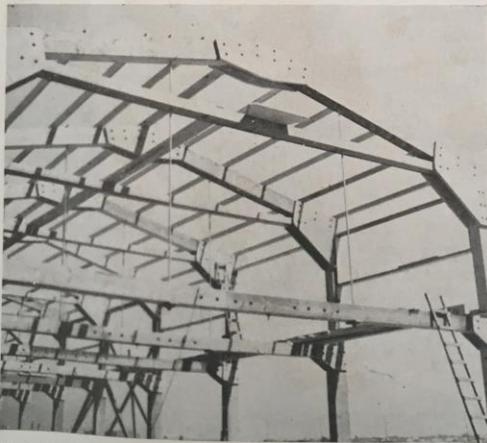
Rigid frames for this 40x160-ft. building aid in supporting the second floor by means of 1½-in. dia. rod hangers. Gusset plates are of plywood and split ring connectors are used.
